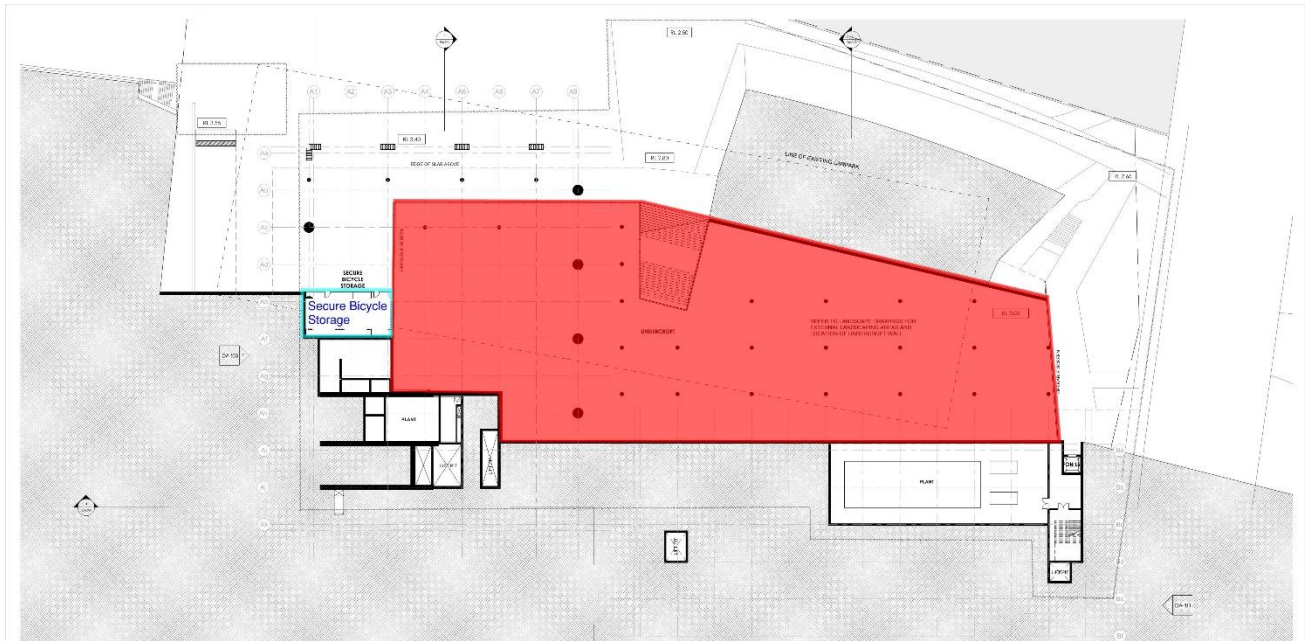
Architectural Plans showing the undercroft location, with adjacent bicycle storage facility
